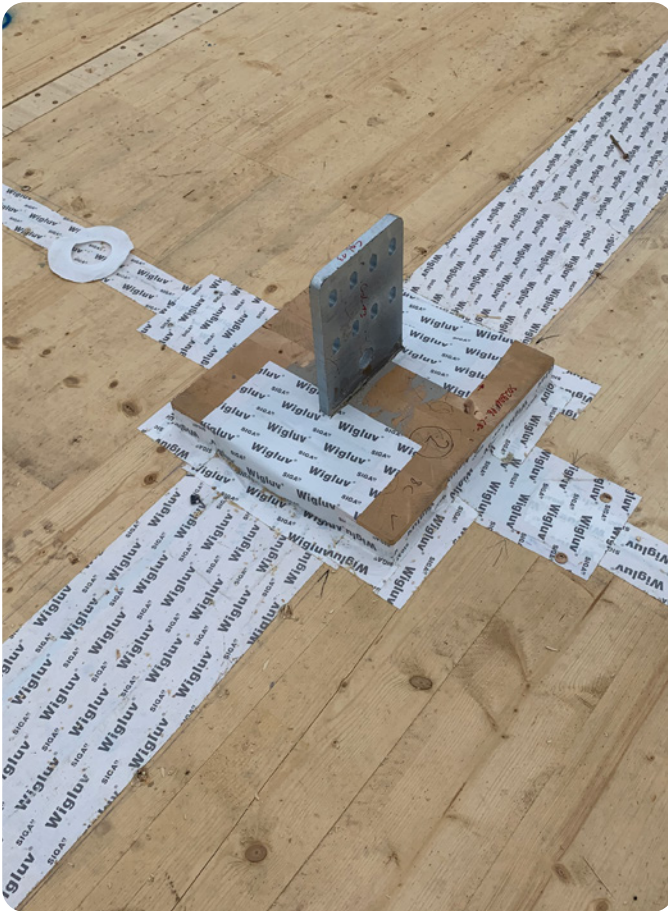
Tapes sealing joint in timber floor (Image credit: TDA)
